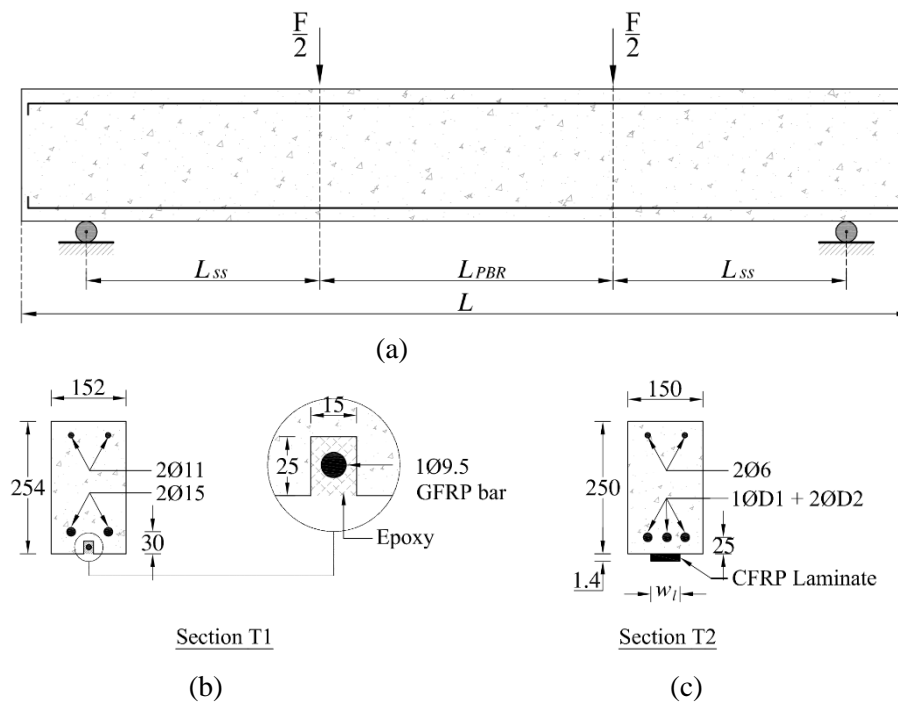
(a) Geometry and loading scheme of the beams considered for model appraisal, reinforcement and strengthening configurations of the beams (b) B1 and B2 tested by Badawi and Soudki (2009), and (c) B3 and B4 tested by Xue *et al.* (2010) (dimensions in mm)
